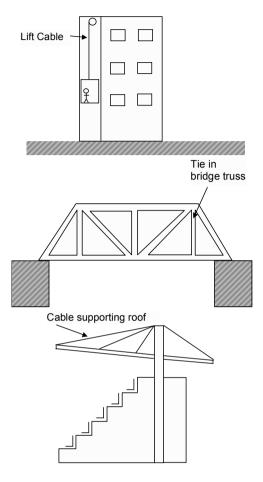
Examples of tension members (Lift cable, tie in a bridge truss, and cable supporting a roof).
